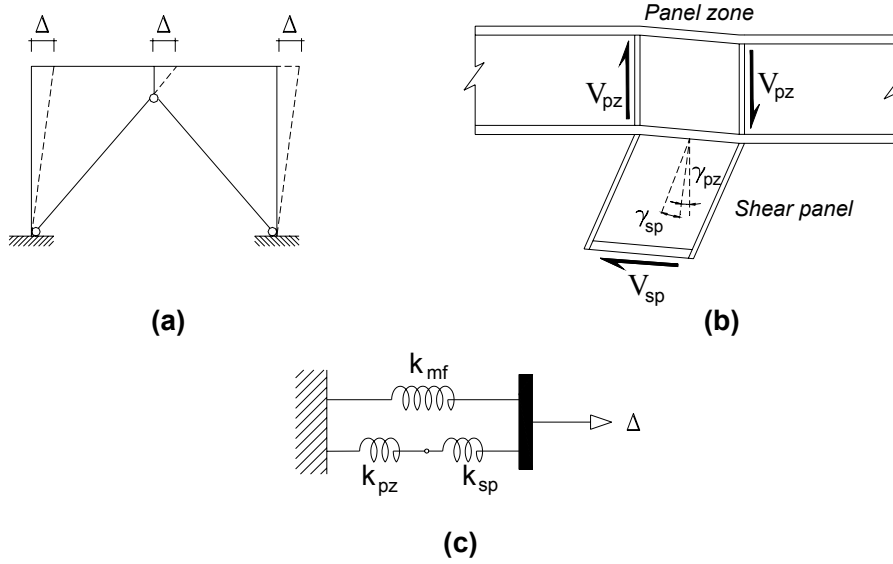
(a) Moment frame braced by shear panel system; (b) deformation of shear panel and beam panel zone in detail; (c) Equivalent spring model for the frame
